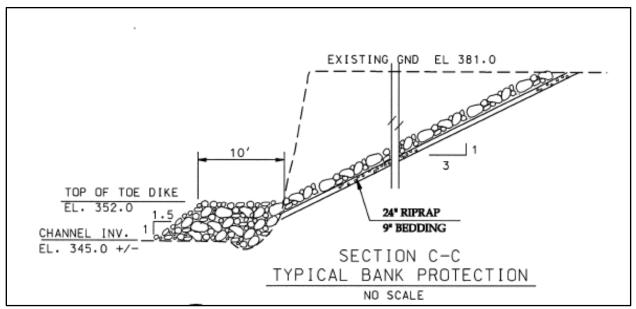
Existing Streambank Protection Project Typical Cross-Section
